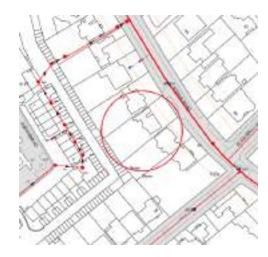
Thames Water Combined Sewer Route Relevant to Site Location
